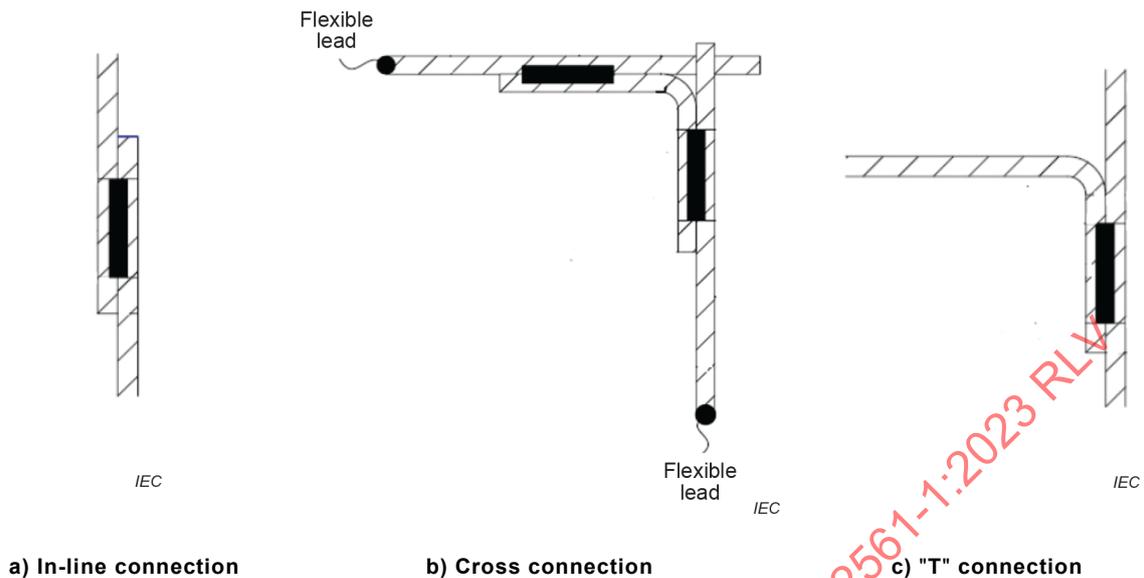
Basic arrangement of specimen with welded, brazed or exothermic connections of reinforcing rods
